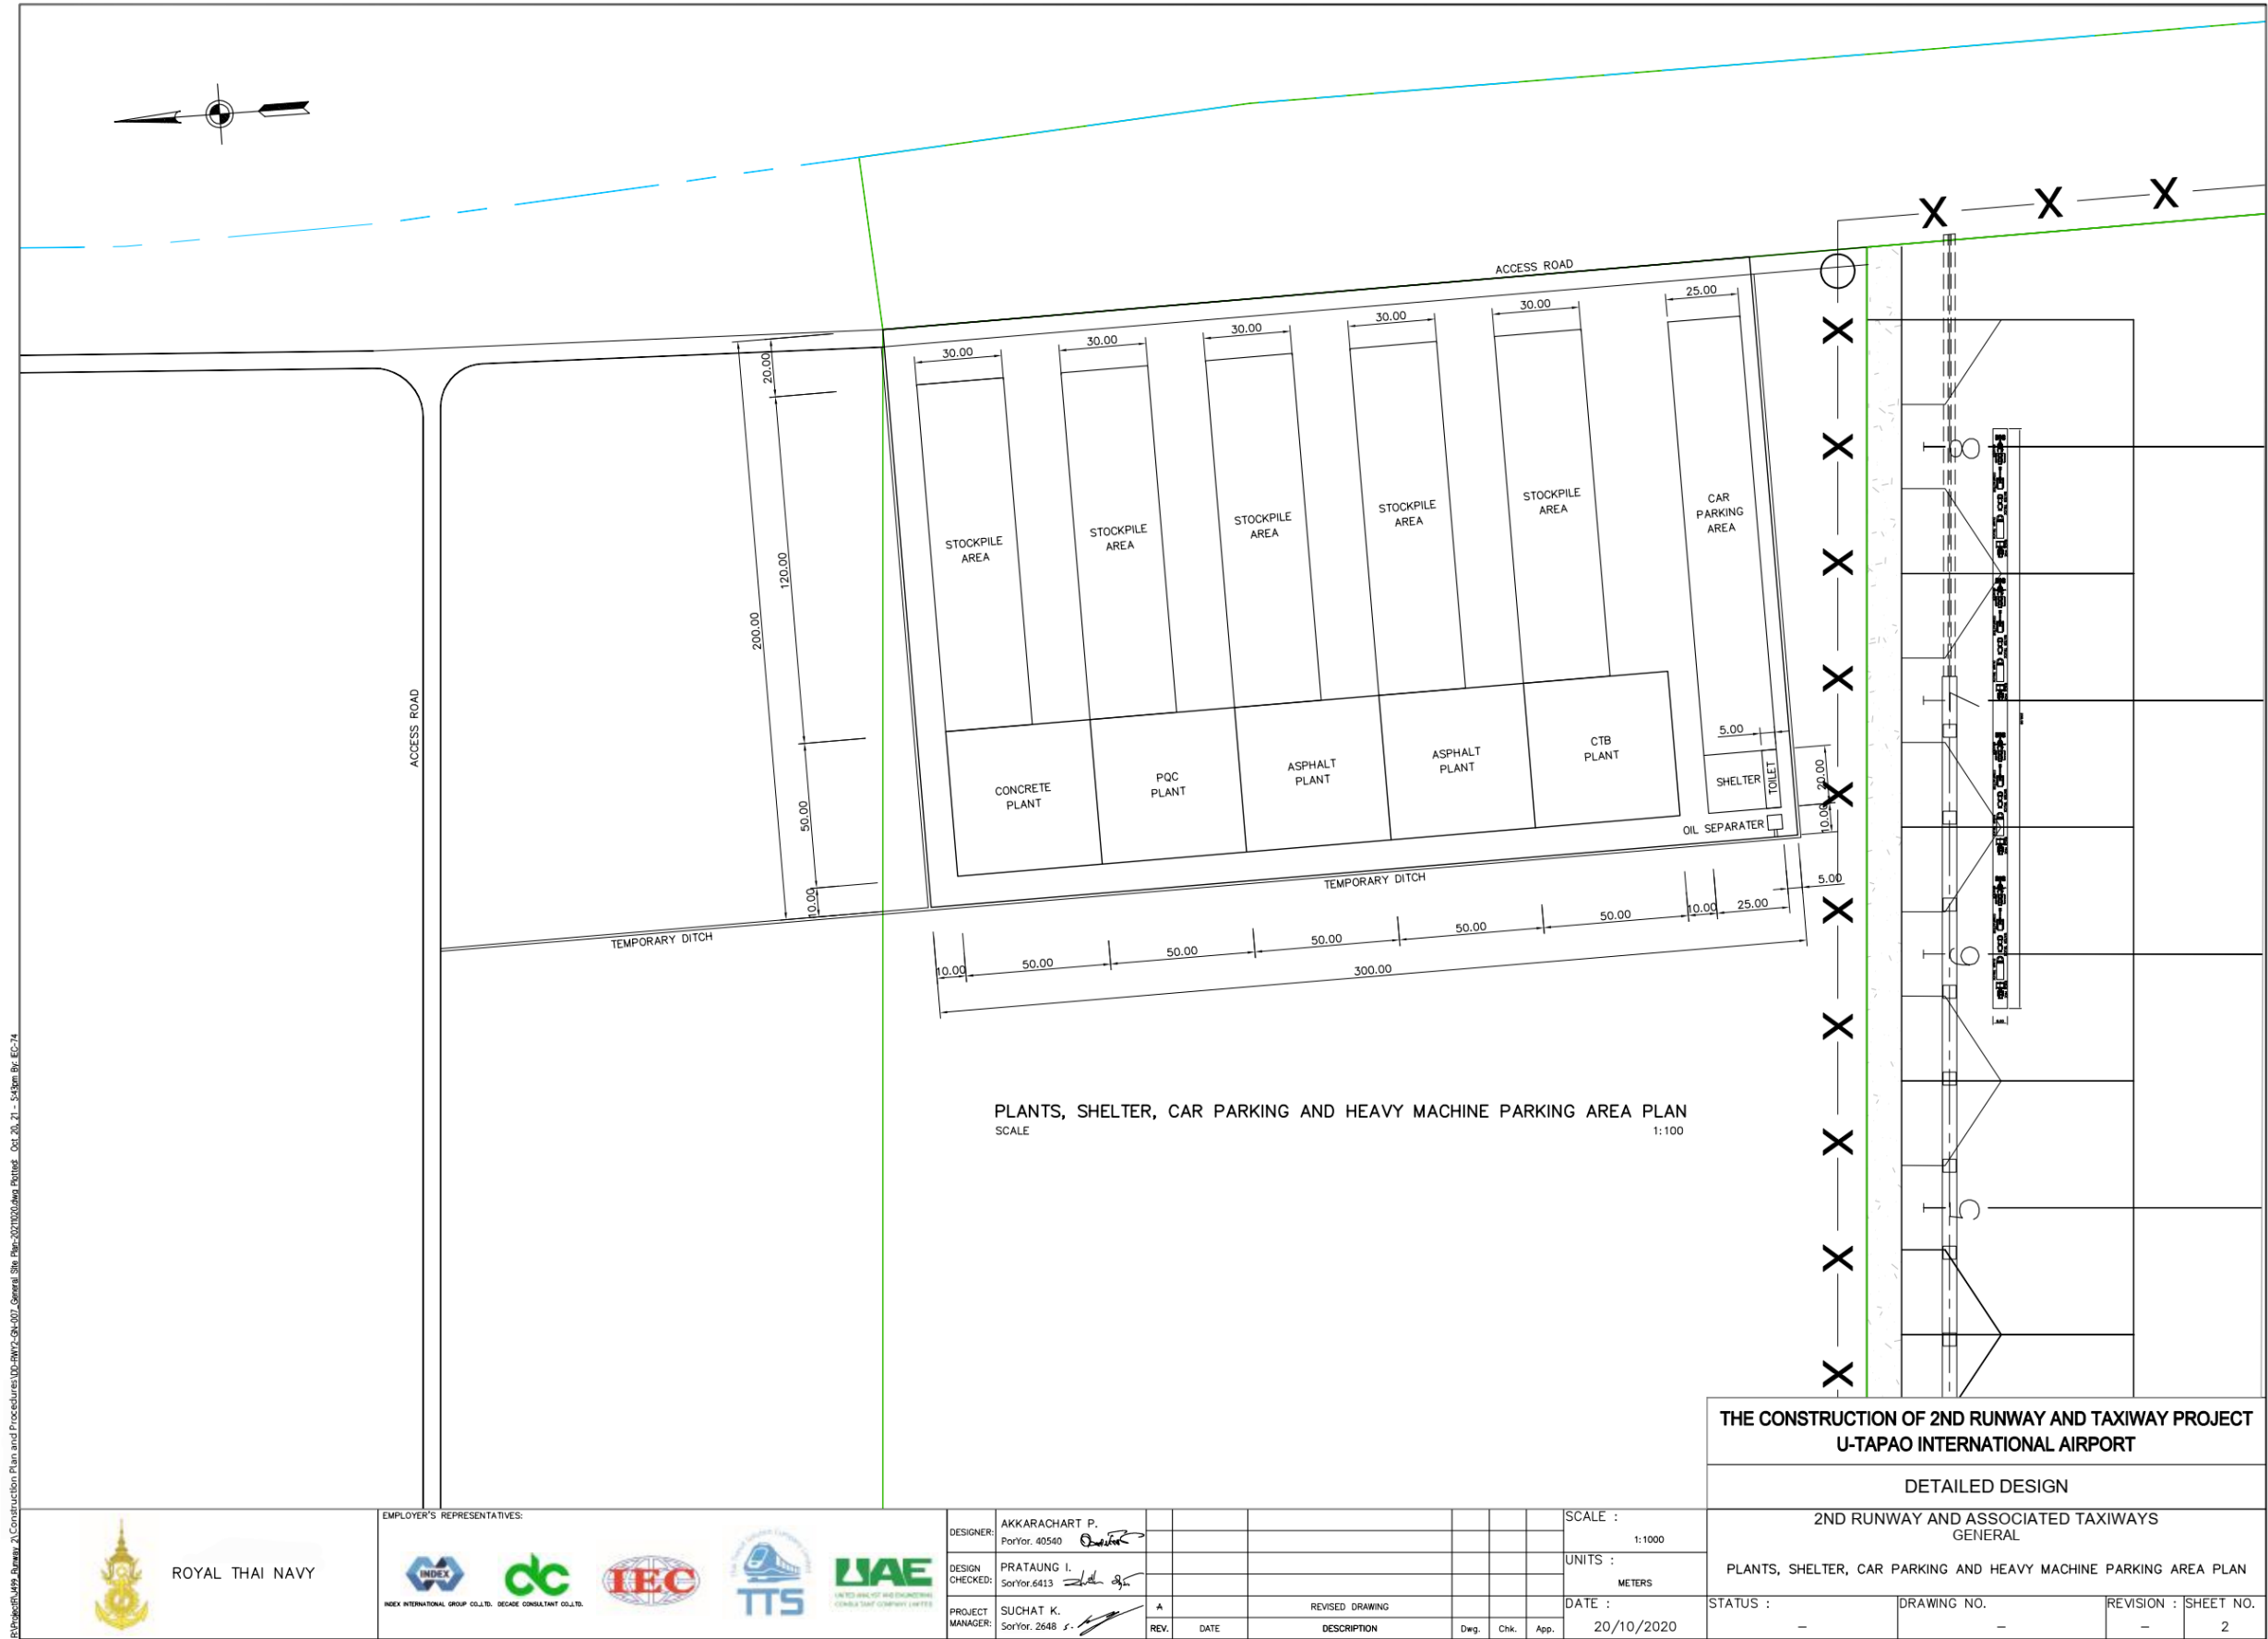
8 Location of pre-mixed concrete mills, asphaltic concrete mills, CTB mills and high quality concrete plants (PQC)
